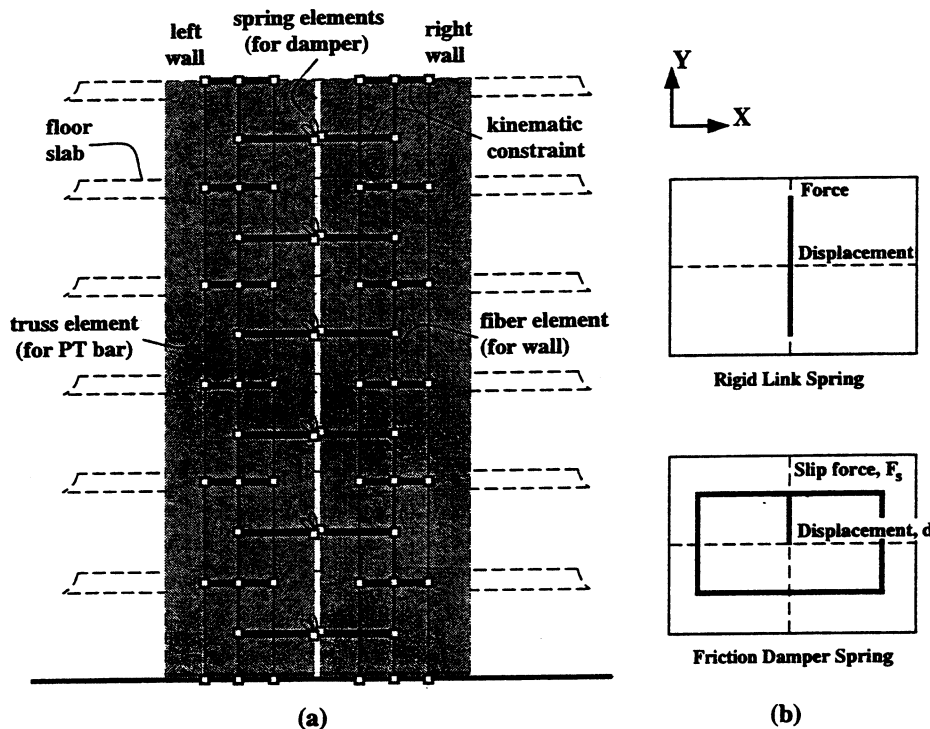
Wall model: (a) multi-story wall; (b) spring elements
